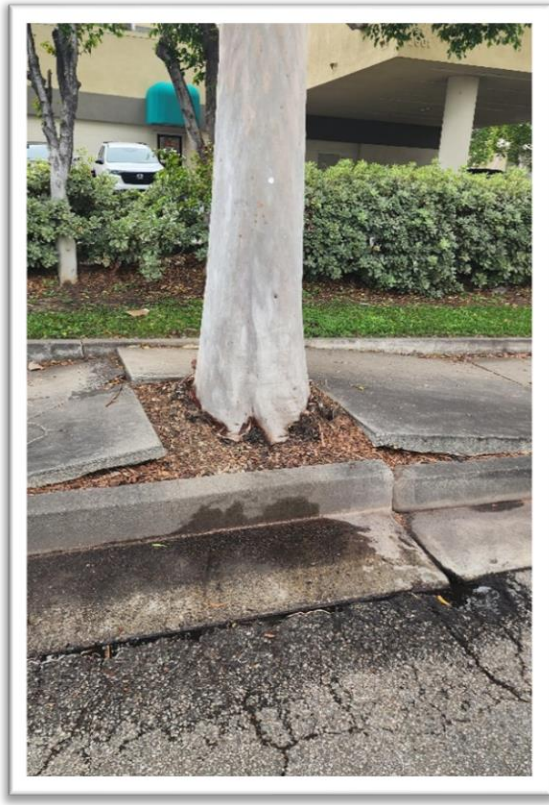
This is a view of a damaged sidewalk and parkway cement from root crown expansion (#492).
